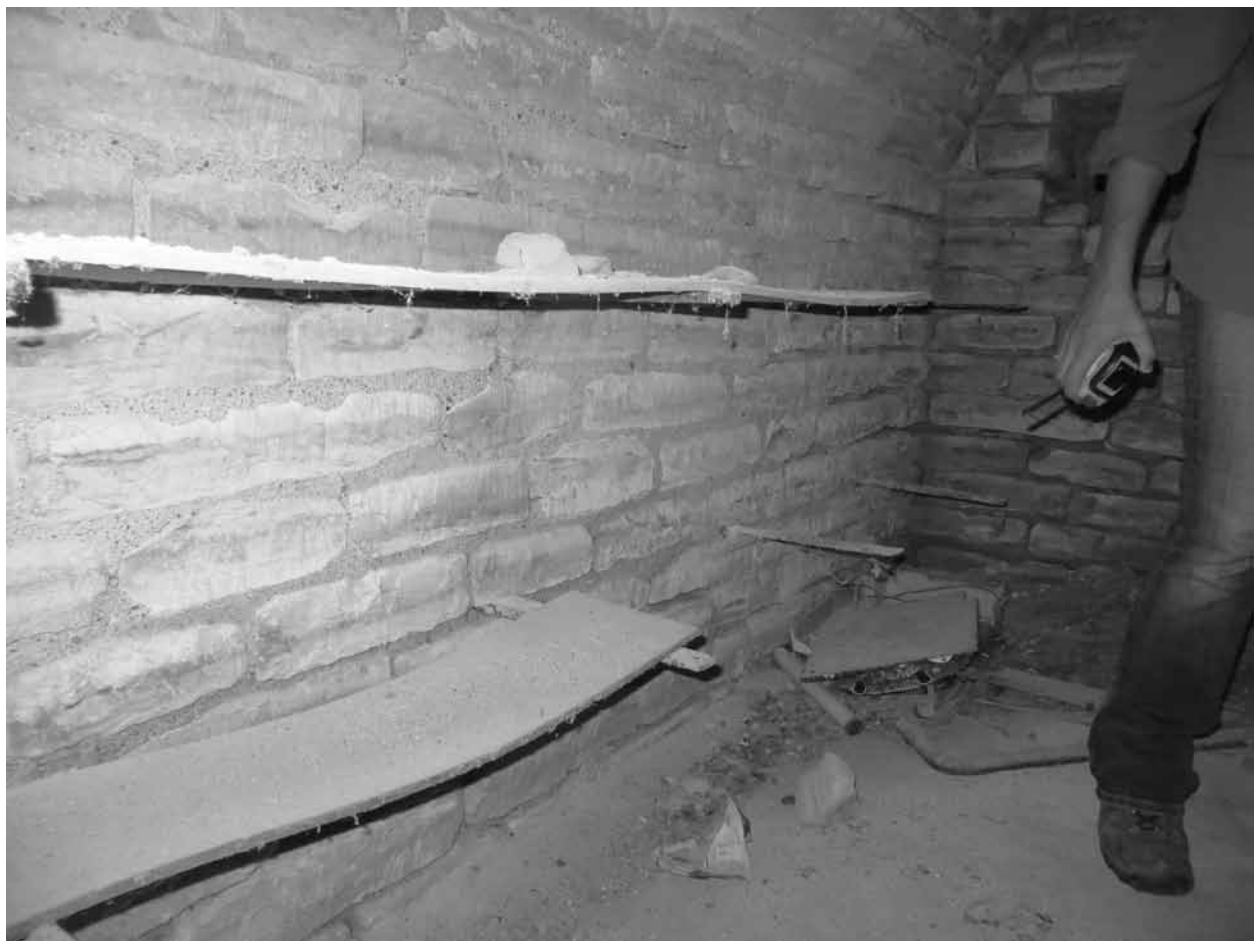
South wall view of Shimek cave 1, showing metal bars built into wall as shelf supports.
